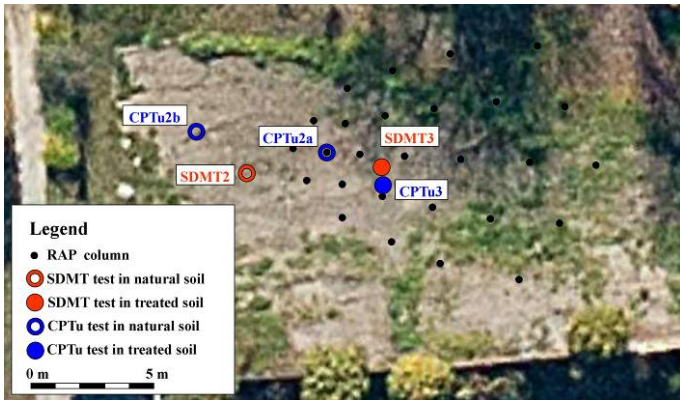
Site investigation and RAP works realized at Site 3, RAP Spacing Trial Area – 2 Brezees Road.
